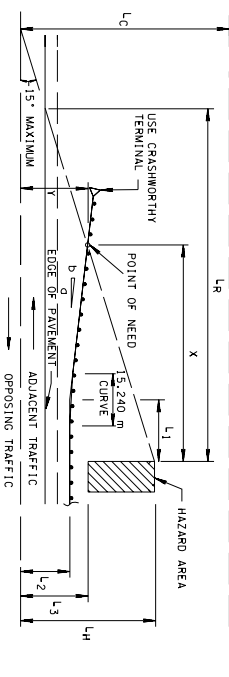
APPROACH BARRIER LAYOUT FOR OPPOSING TRAFFIC
